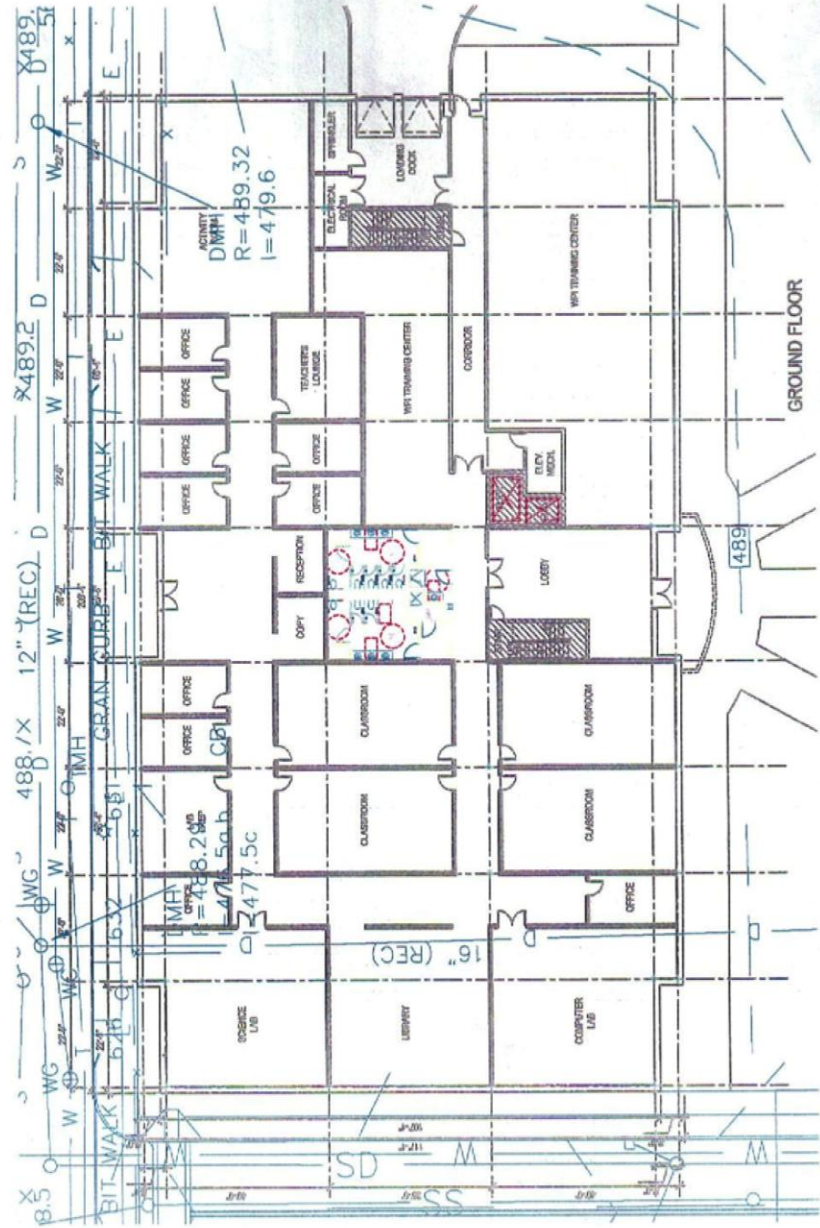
Floor Plan - Massachusetts Academy of Math and Science
